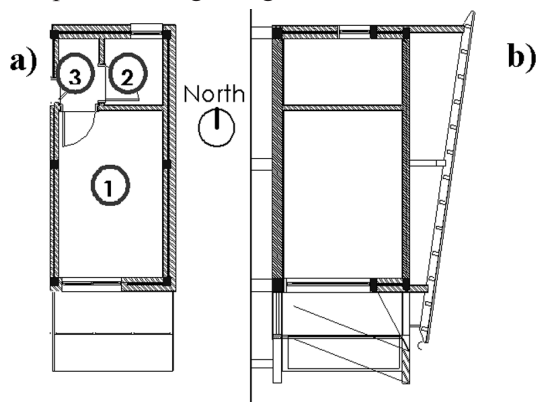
CTC drawings; a) floor plan; b) cross-section.
